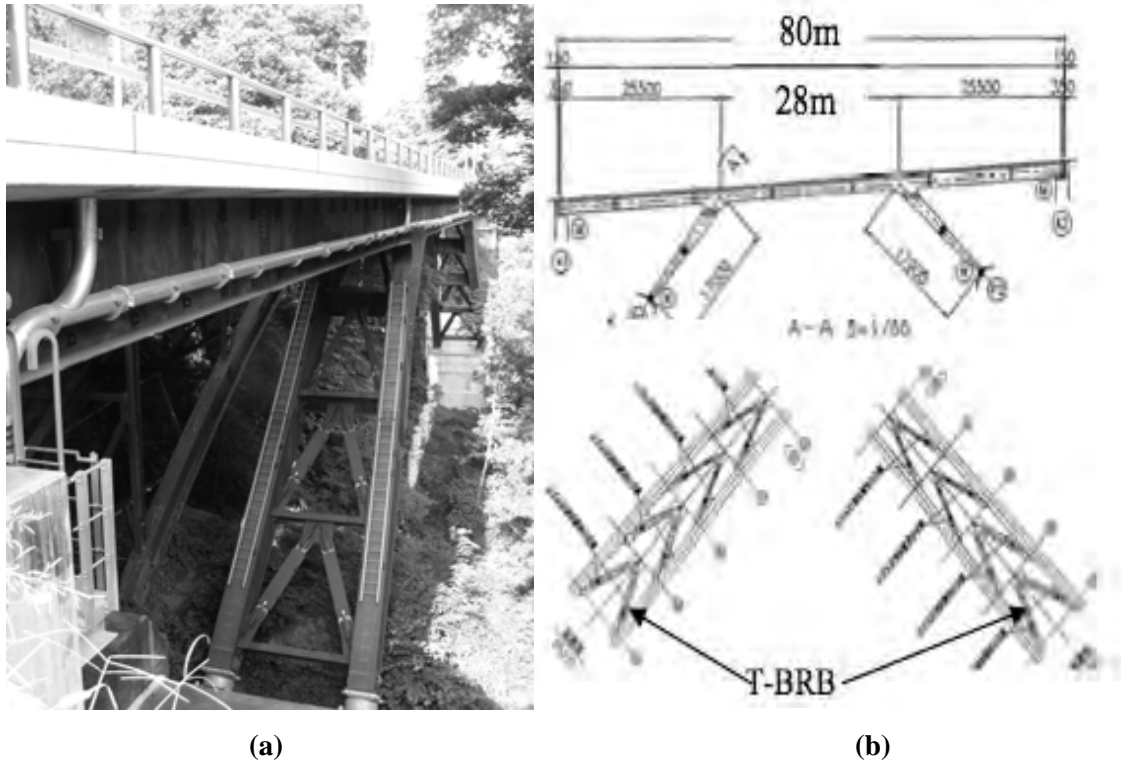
Layout of BRBs Installed in the Bridge (Oya et al., 2009): (a) photo view; (b) drawing of the T-BRB in the bridge
